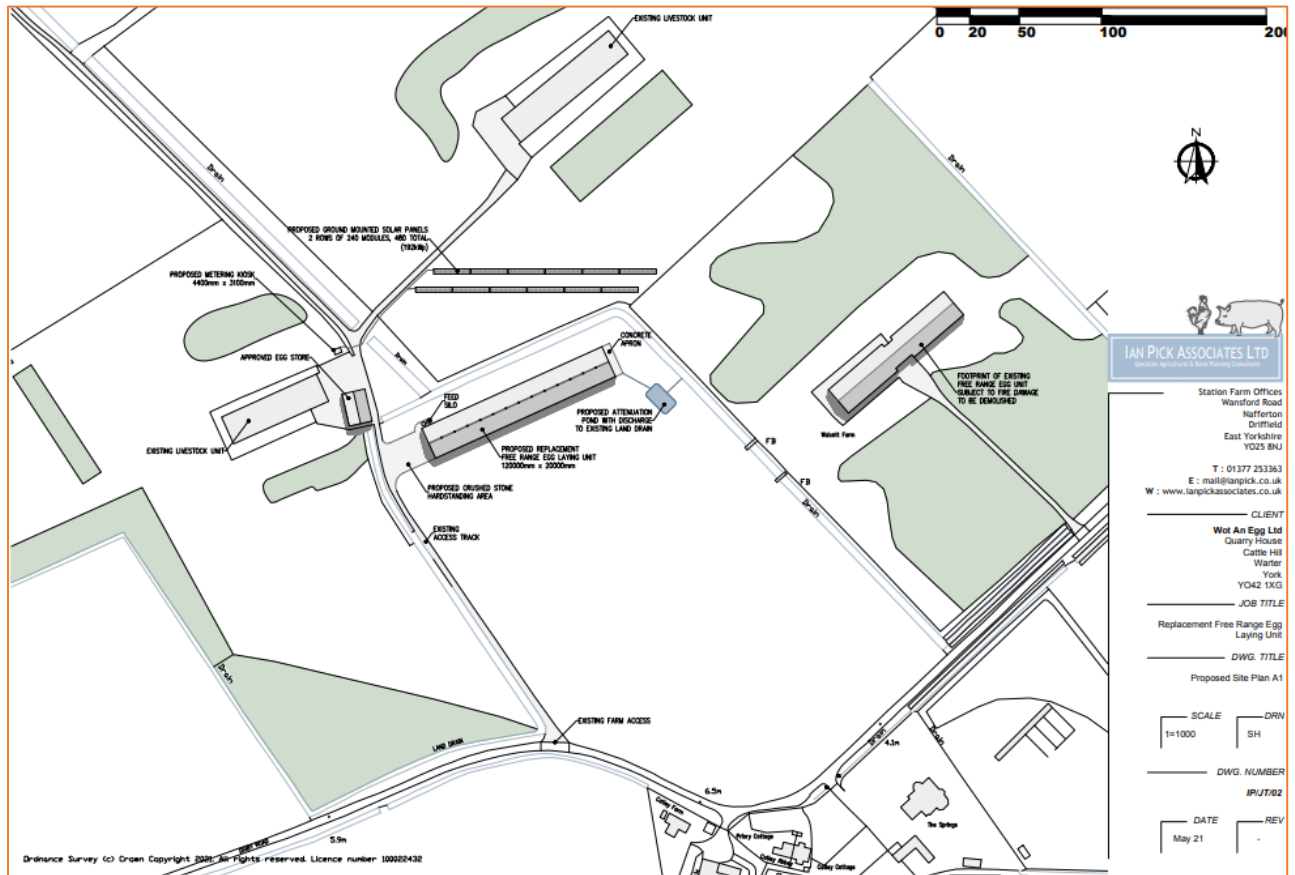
Proposed Site Plan (Source: Ian Pick Associates Ltd)
